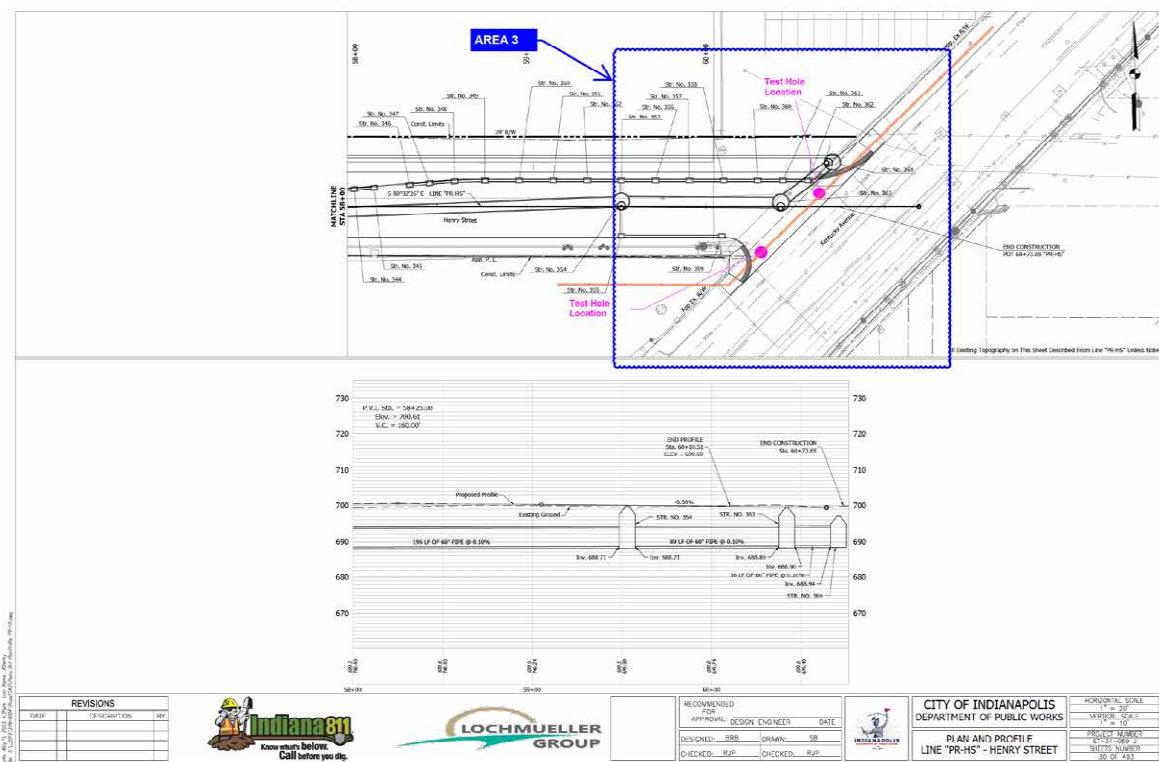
CAD DRAWING SHOWING THE SUE TEST LOCATIONS IN AREA 3.
